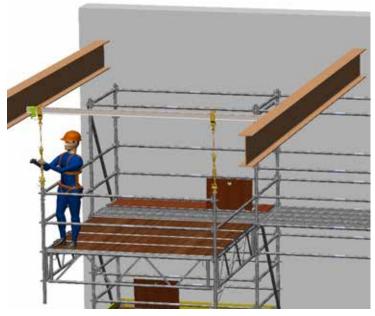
Assembly of intermediate beam on flange of steel girders .
